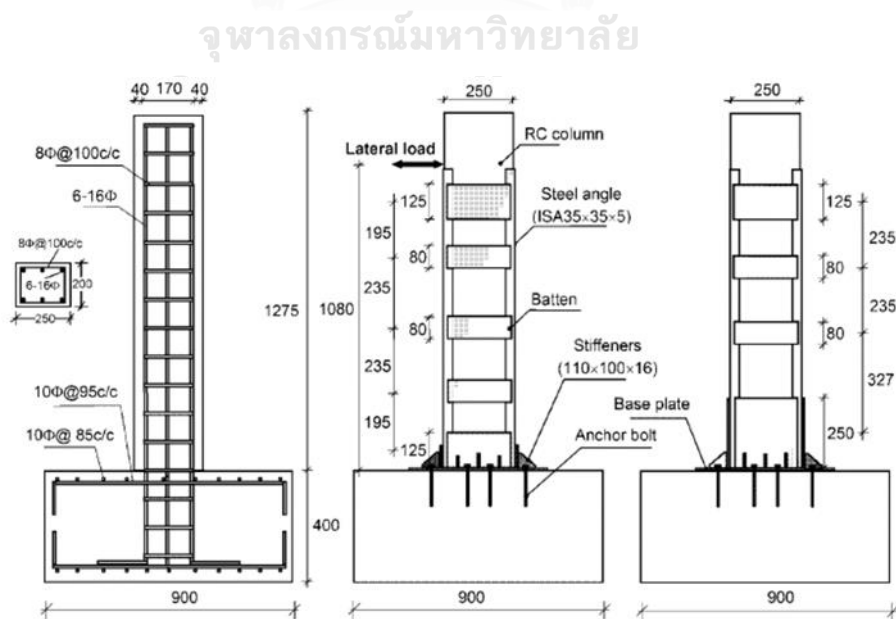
Detail of test specimens (Nagaprasad et al., 2009)
